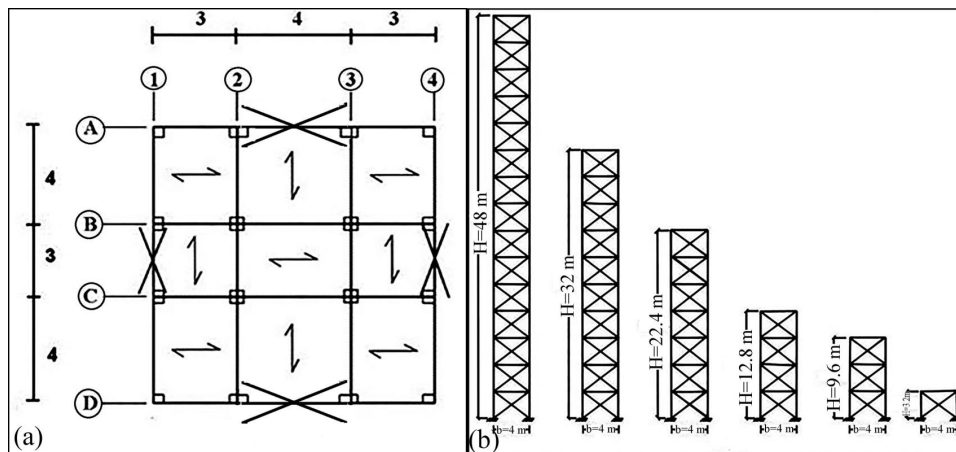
a) Plan of buildings, b) studied X-braced frames
